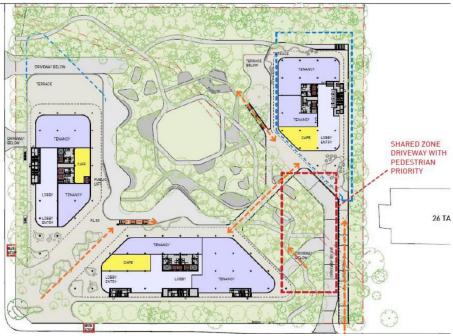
Lower ground floor - Pedestrian access to Building A shown by the orange line.
